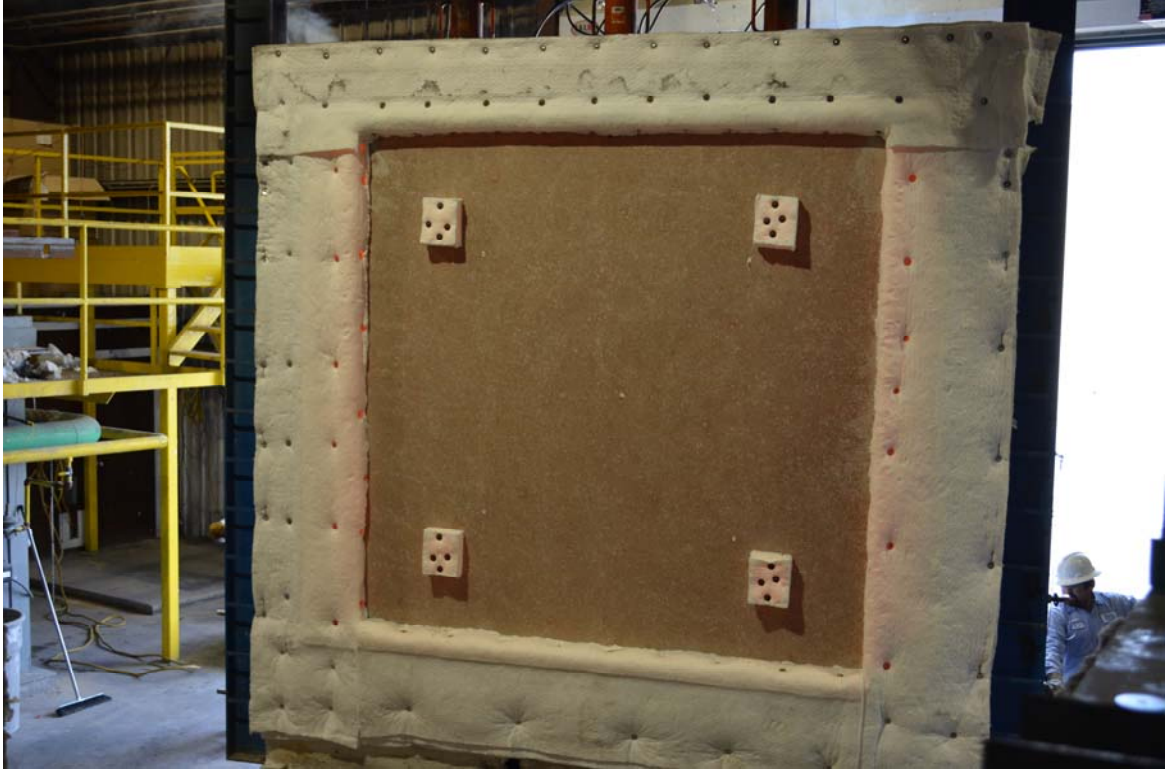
Close-Up Showing the Unexposed Wall Resting on the Test Frame at 136 min.
